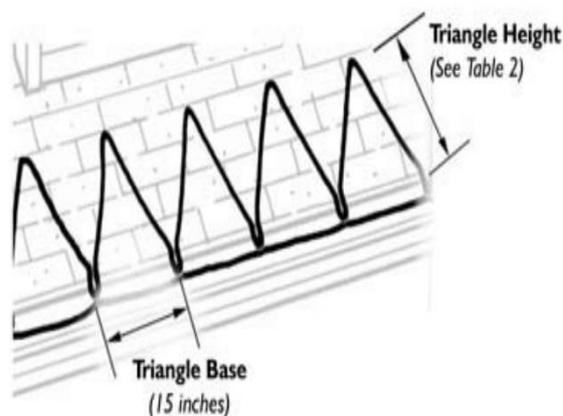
Typical pattern along roofline and in gutters/downspouts.
